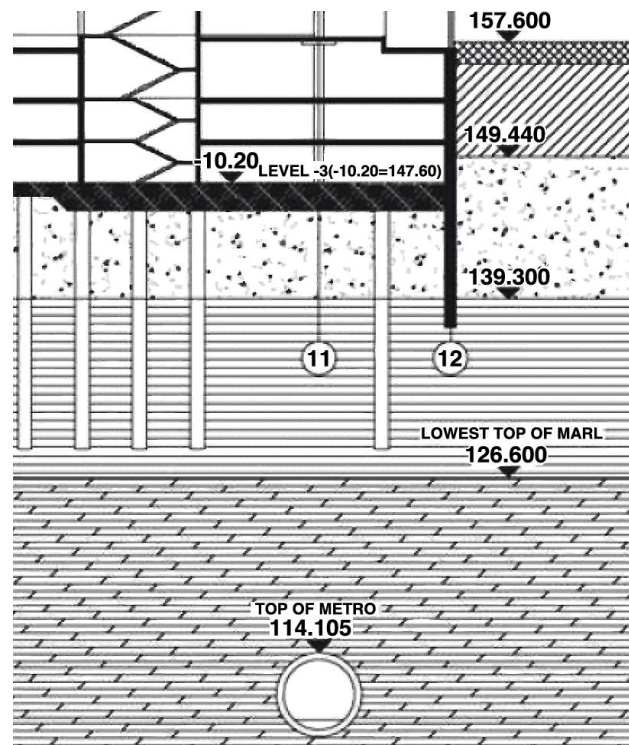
Piled raft foundation and subsoil profile, all elevations in meters.
